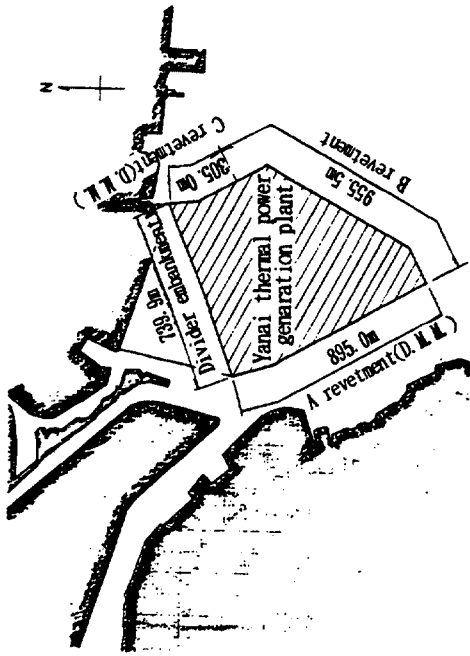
DMM used to create a "floating foundation" at Yanai power station, Japan (Noriyasu et al., 1996).
